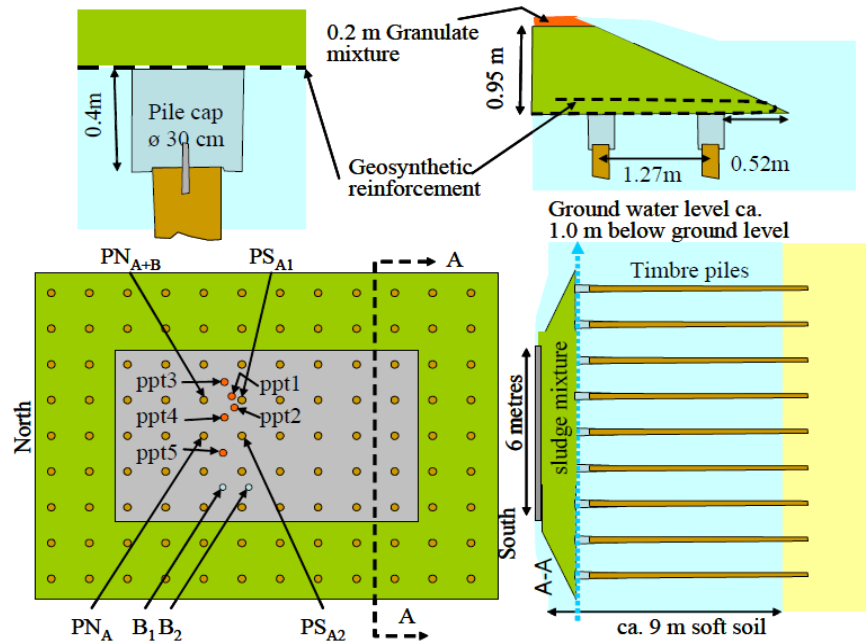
Layout of the Kyoto road field test (after Eekelen, 2009)
